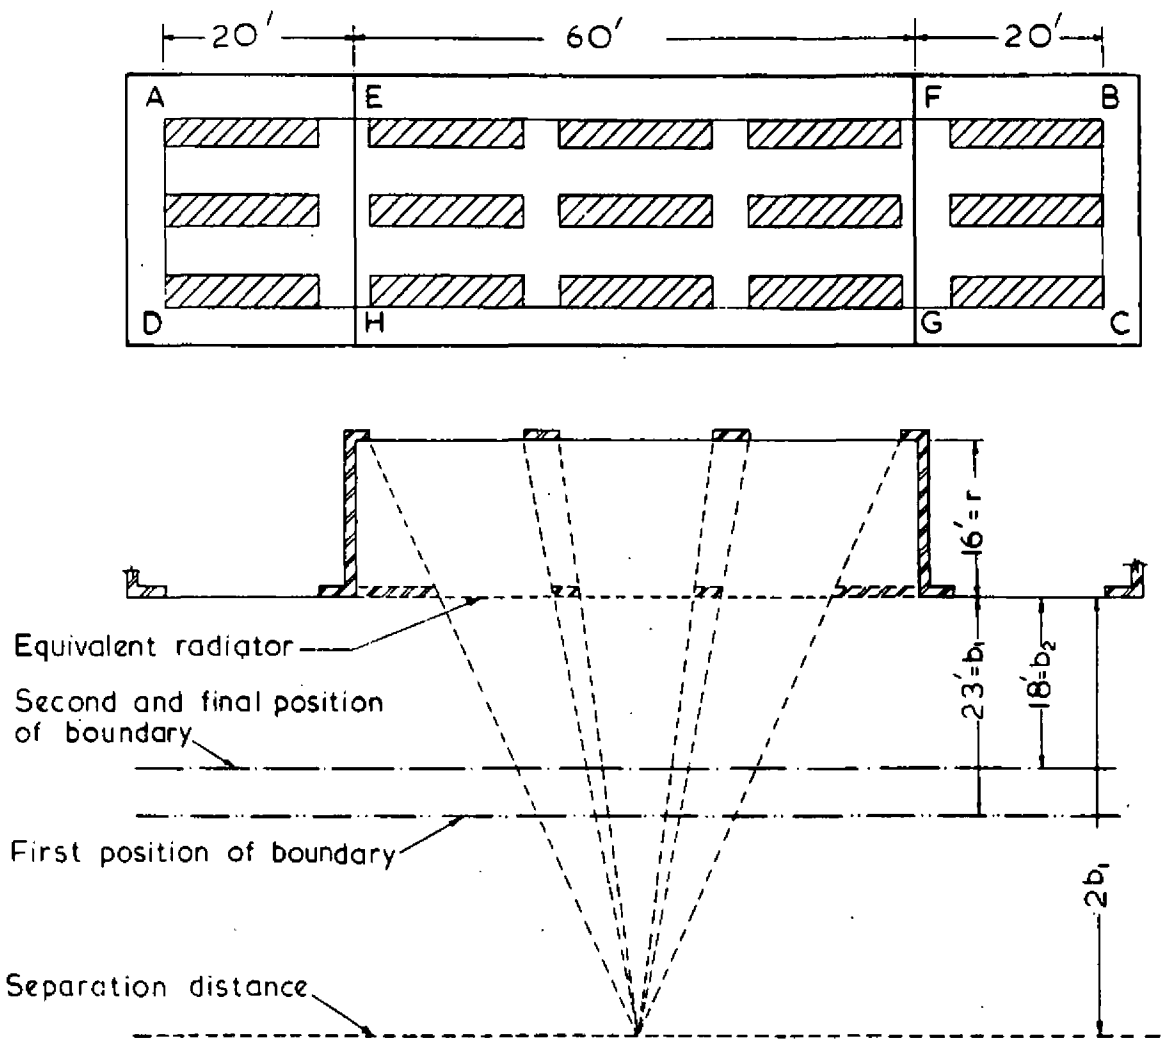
RECESSED ELEVATION. OPENINGS IN REAR WALL ONLY
